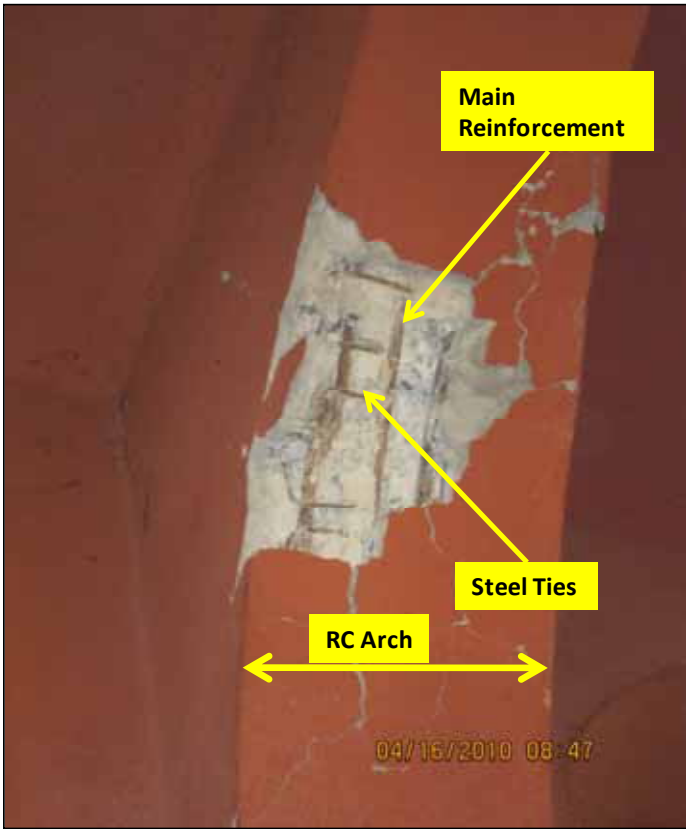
Interior spalling of RC cover – showing construction details
